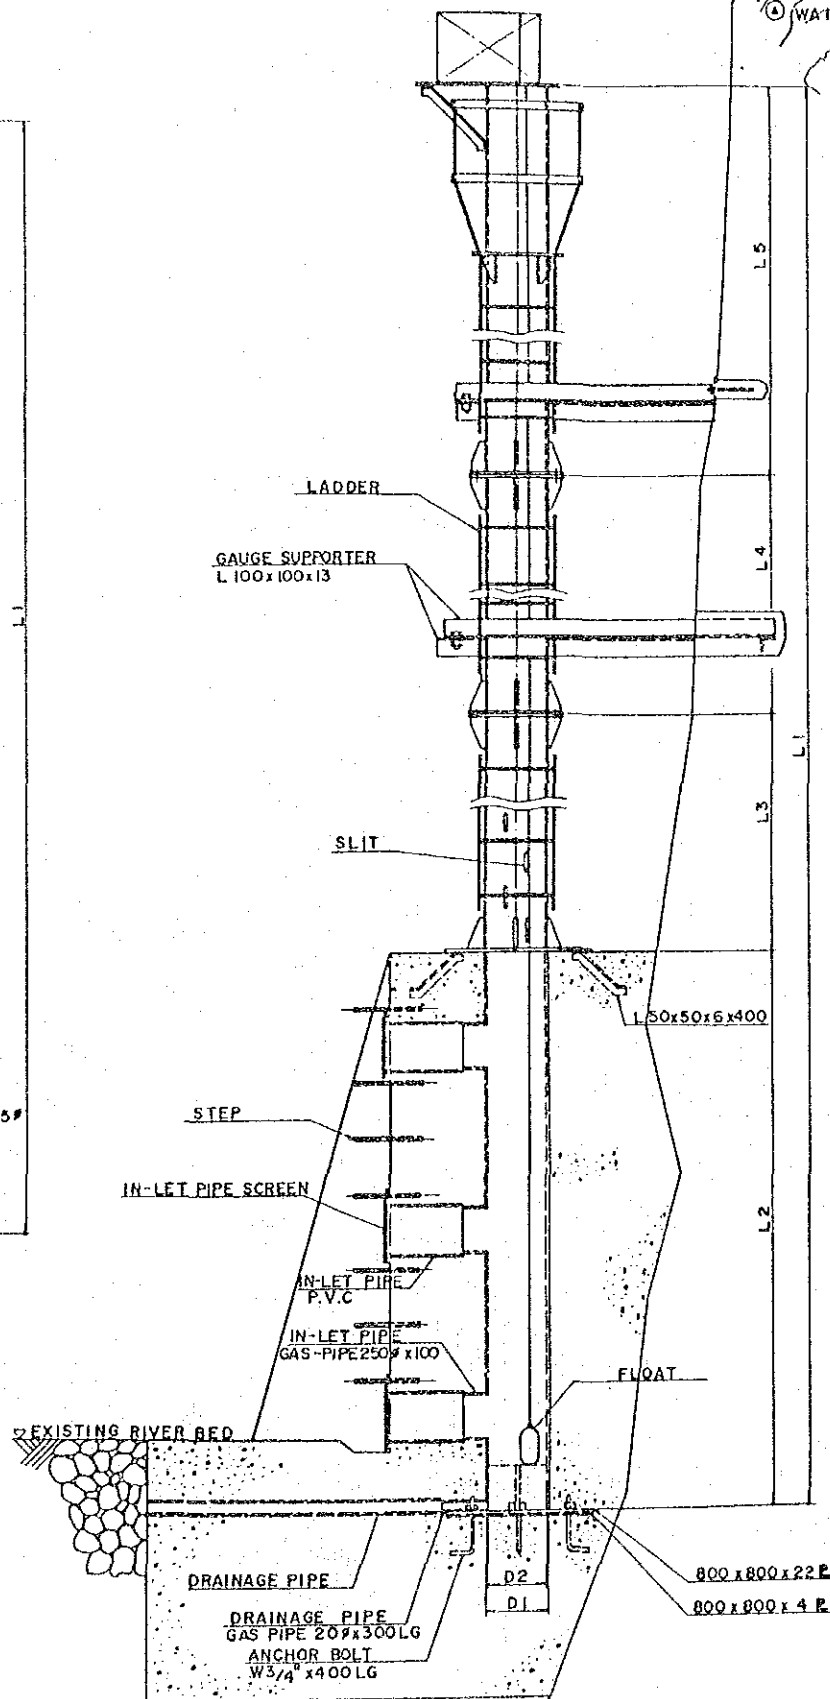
(2) Structural Drawing of Steel Pipe Type Wadi Gauge
